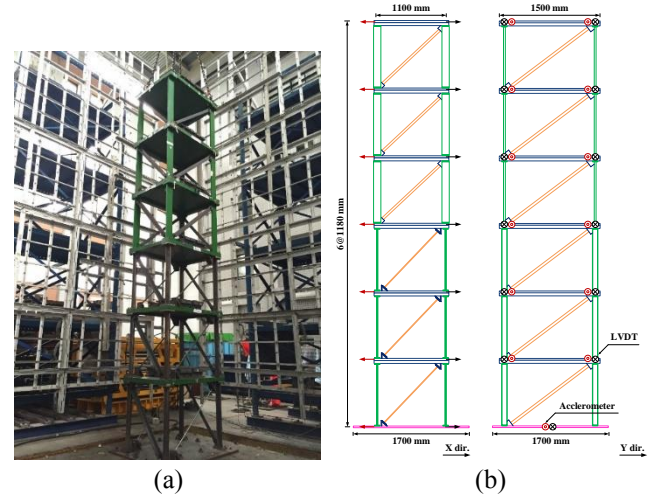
The 1/3-scale 6-story steel structure. (a) Overview and (b) plane views with sensor arrangement
